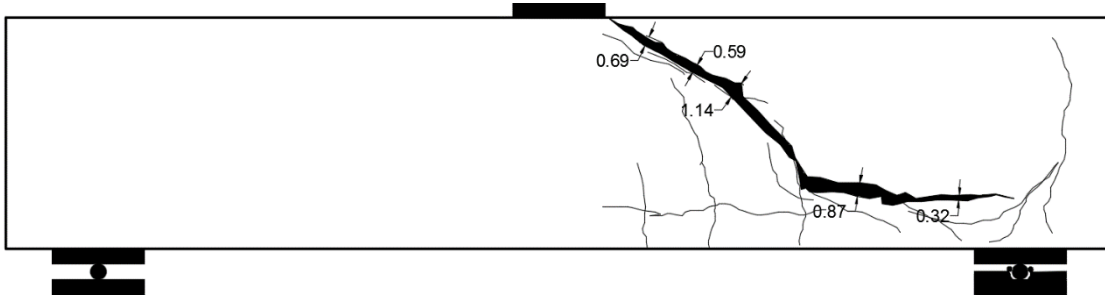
Crack pattern at failure for SNFRC 0.5% beam #21
